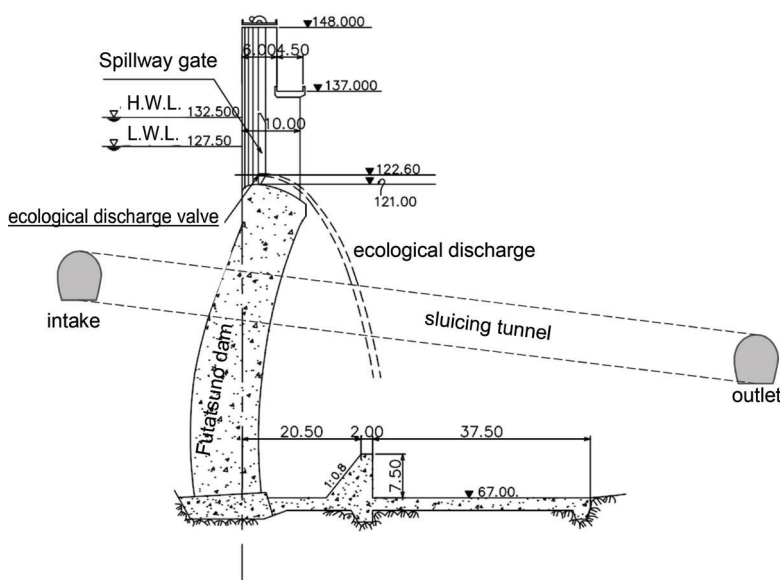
Layout of sluicing tunnel at Futatsuno (in cross section)
